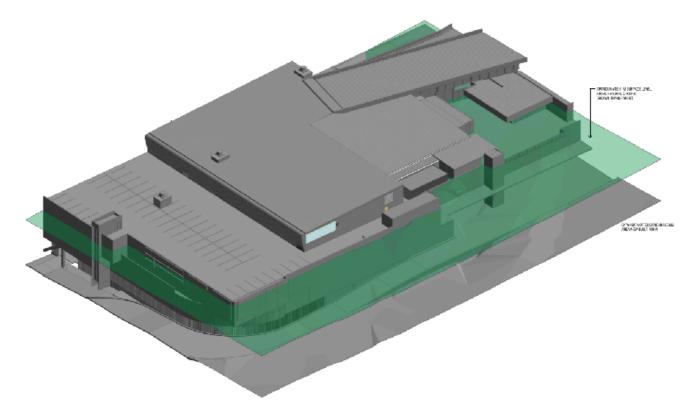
Location and appearance of the proposed works at the eastern elevation.
